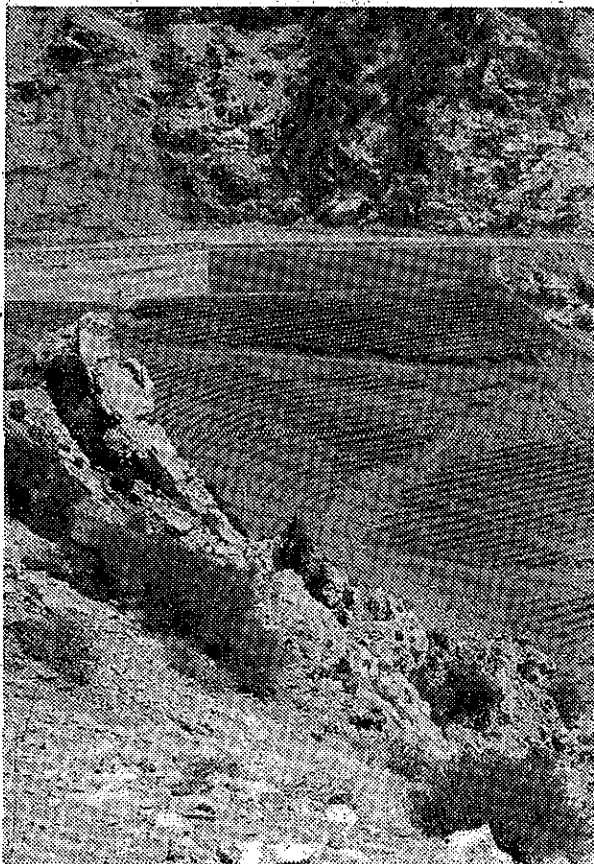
Distant View of Slope Terracing and Access Road (August 1979)
